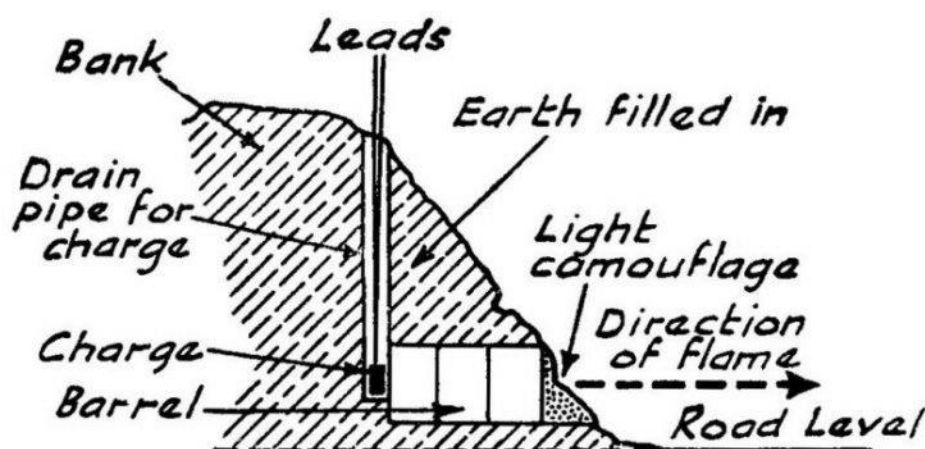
Barrel installed. Emplacement filled in. Charge lowered into position in drain pipe.
